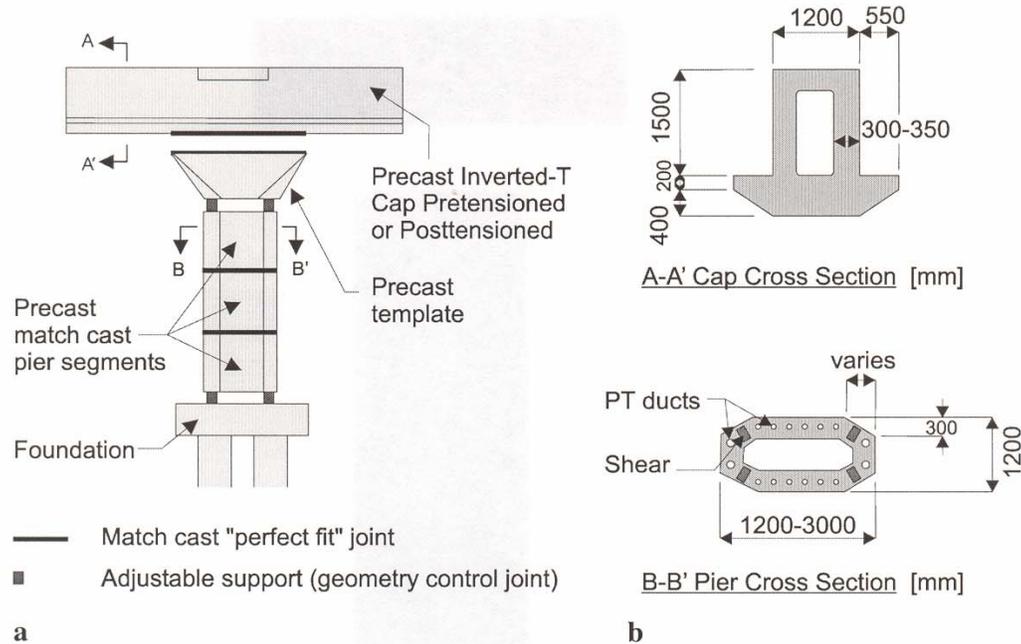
(a) Segmental pier system; (b) match-cast column segment, precast temple segment, inverted-T cap match cast, cap and pier cross sections. [Source: Billington et al. (21).]
